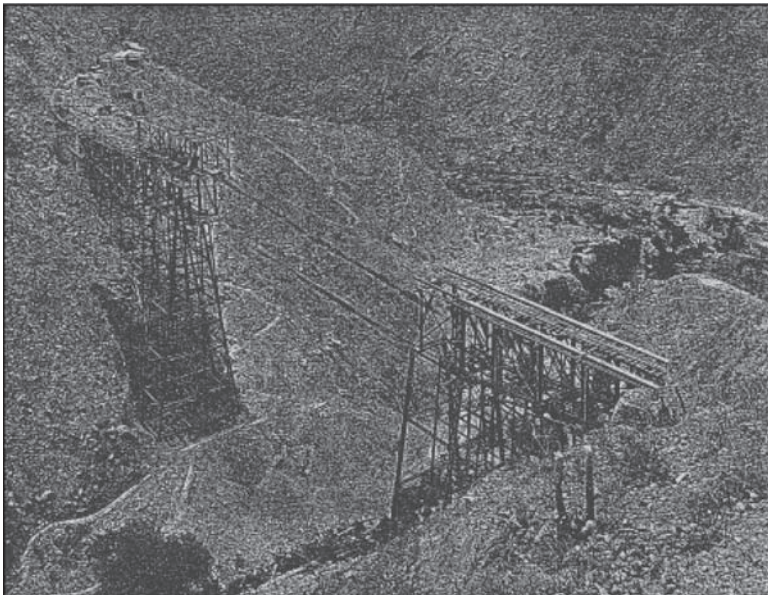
Aerial view of on-going new construction of cantilever span on Lima side (left).
